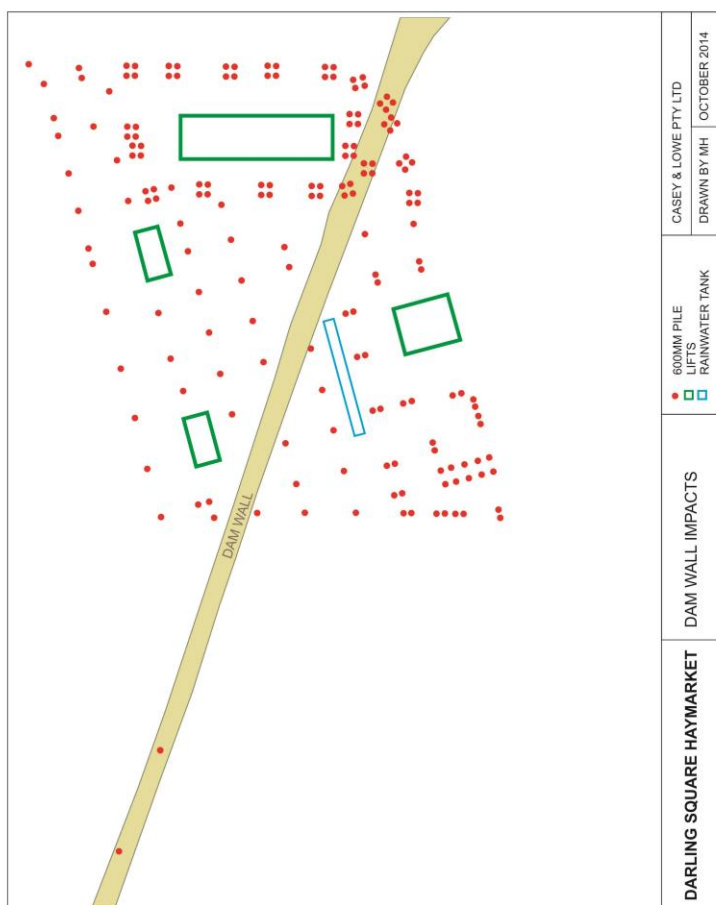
Location of the dam wall relative to proposed piles (red dots), the rainwater tank (blue rectangle) and lift shafts (green rectangles). Transfer beams have not been shown as they will not impact on the dam. Transfer beams that would impact on the wall are shown in Figure 6.3.
